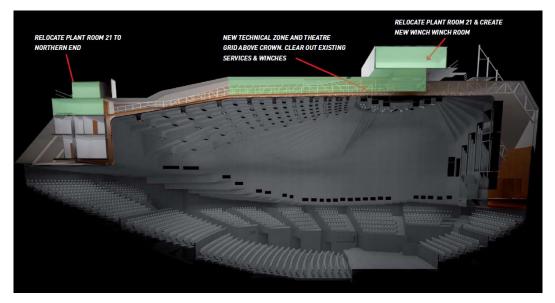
Concert Hall Concept Design – Section Showing Changes Proposed to Technical Zone
